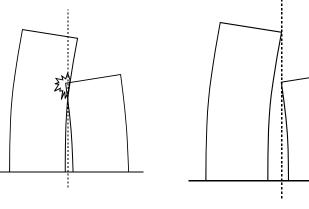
(a): Different Floor Height Buildings Suffer More in Pounding Fig 2.2 (b): Pounding due to Small Gap of Two Buildings
